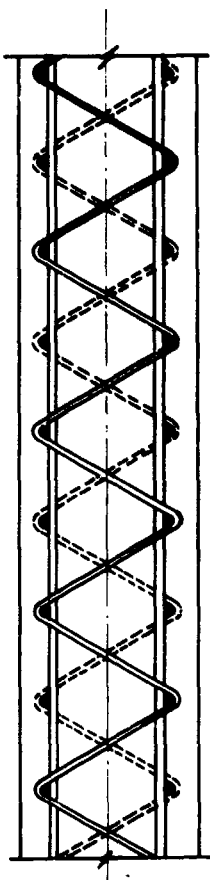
NEW METHOD OF REINFORCEMENT USING LACING STEEL
